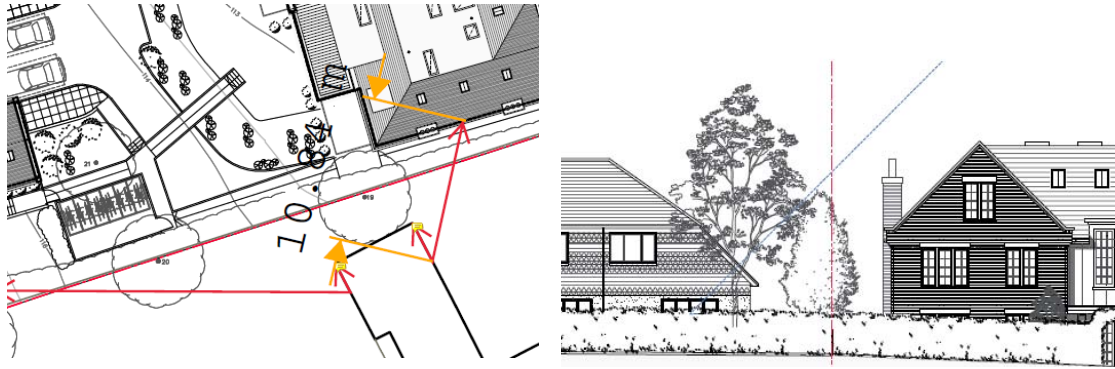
Relationship of Proposed Building with Neighbouring Property No. 60 Welcomes Road.
